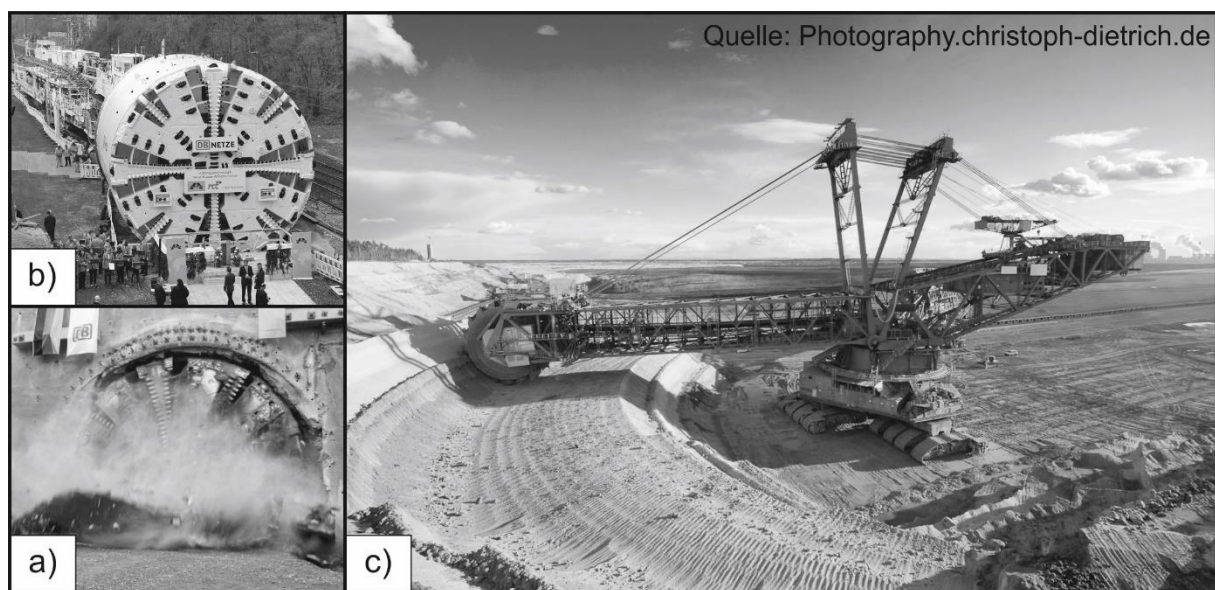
a) Tunneling machine being ceremoniously started b) Tunnel breakthrough c) brown-coal excavator [g]
